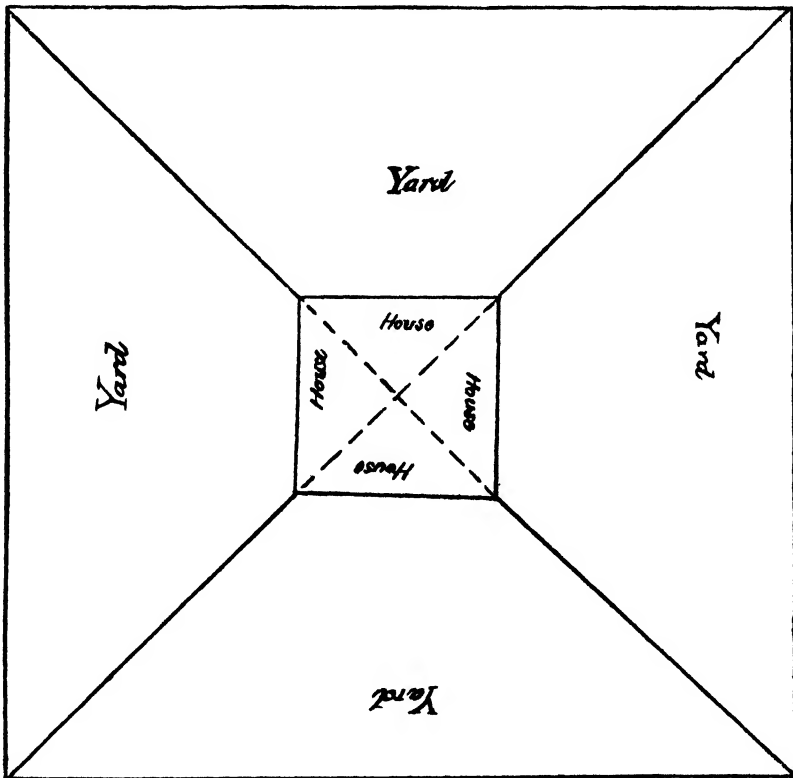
A CONVENIENT ARRANGEMENT OF YARDS AND HOUSES.
